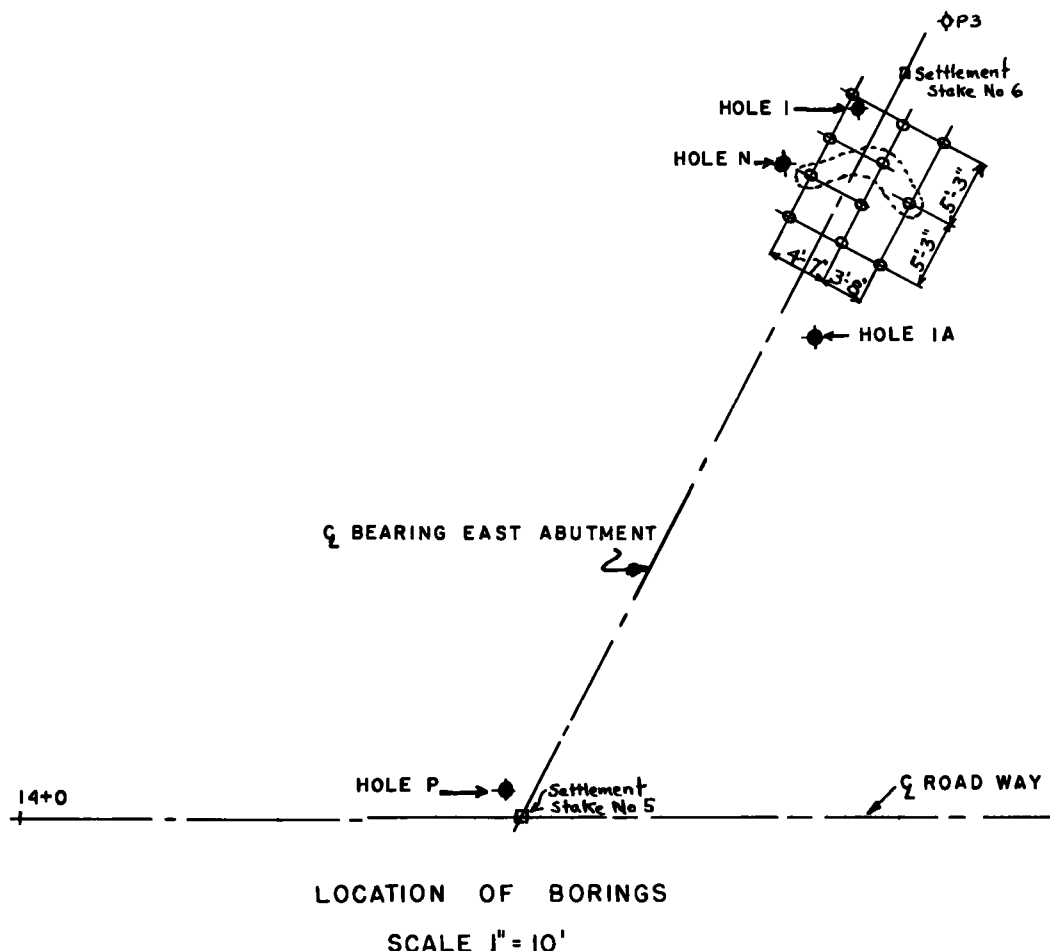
Location plan at east abutment for: test piles; borings for holes N, P, 1, 1A; settlement stakes 5, 6; piezometer P3.
